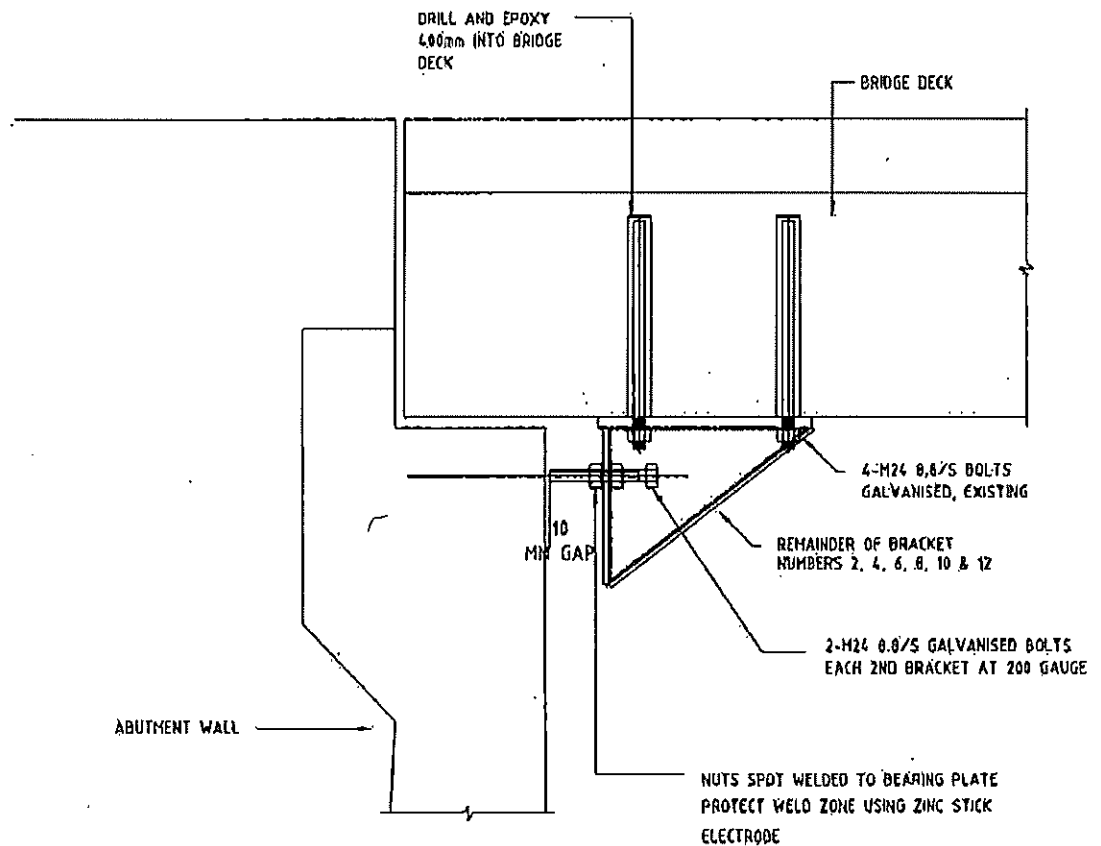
Figure A – Bracket Adjustment Detail (courtesy John Matheson & Associates)
